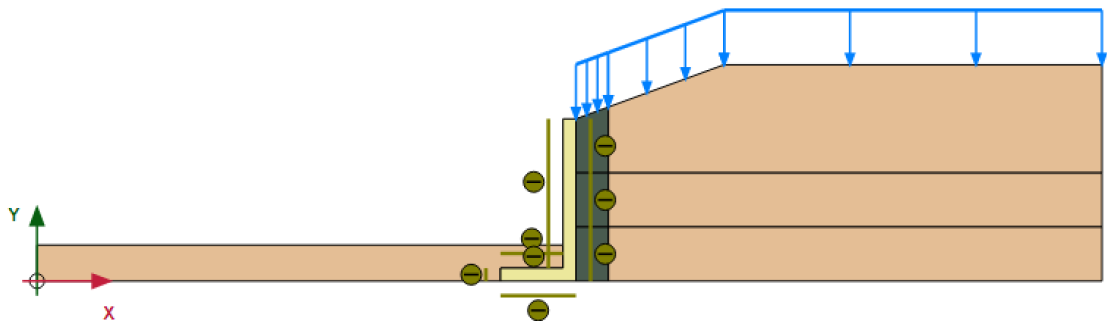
Retaining wall with backfill slope 20° and 0.9m TDA backfill
